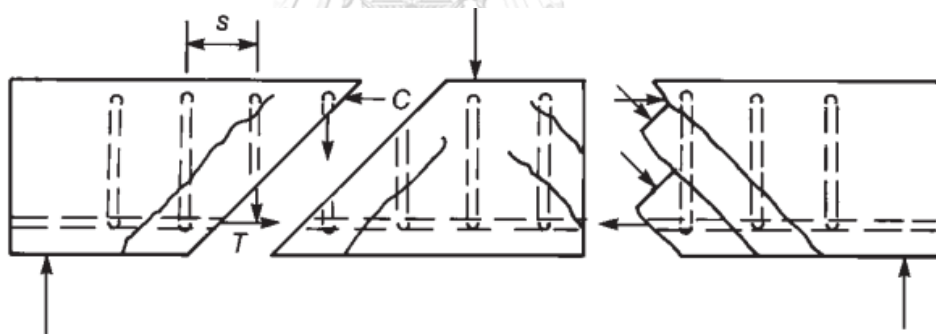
Internal forces in a cracked beam (MacGregor et al., 1997)
